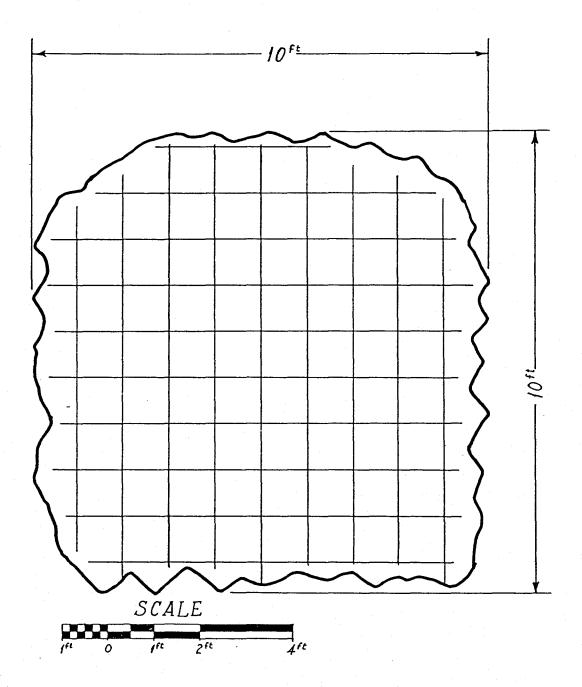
Water-side rebar cage (mat) for temperature and shrinkage control in the F-Level Brenneman/Sunnyside Connection, #6 bars, 12-in. spacing, 3-in. minimum depth of cover.
